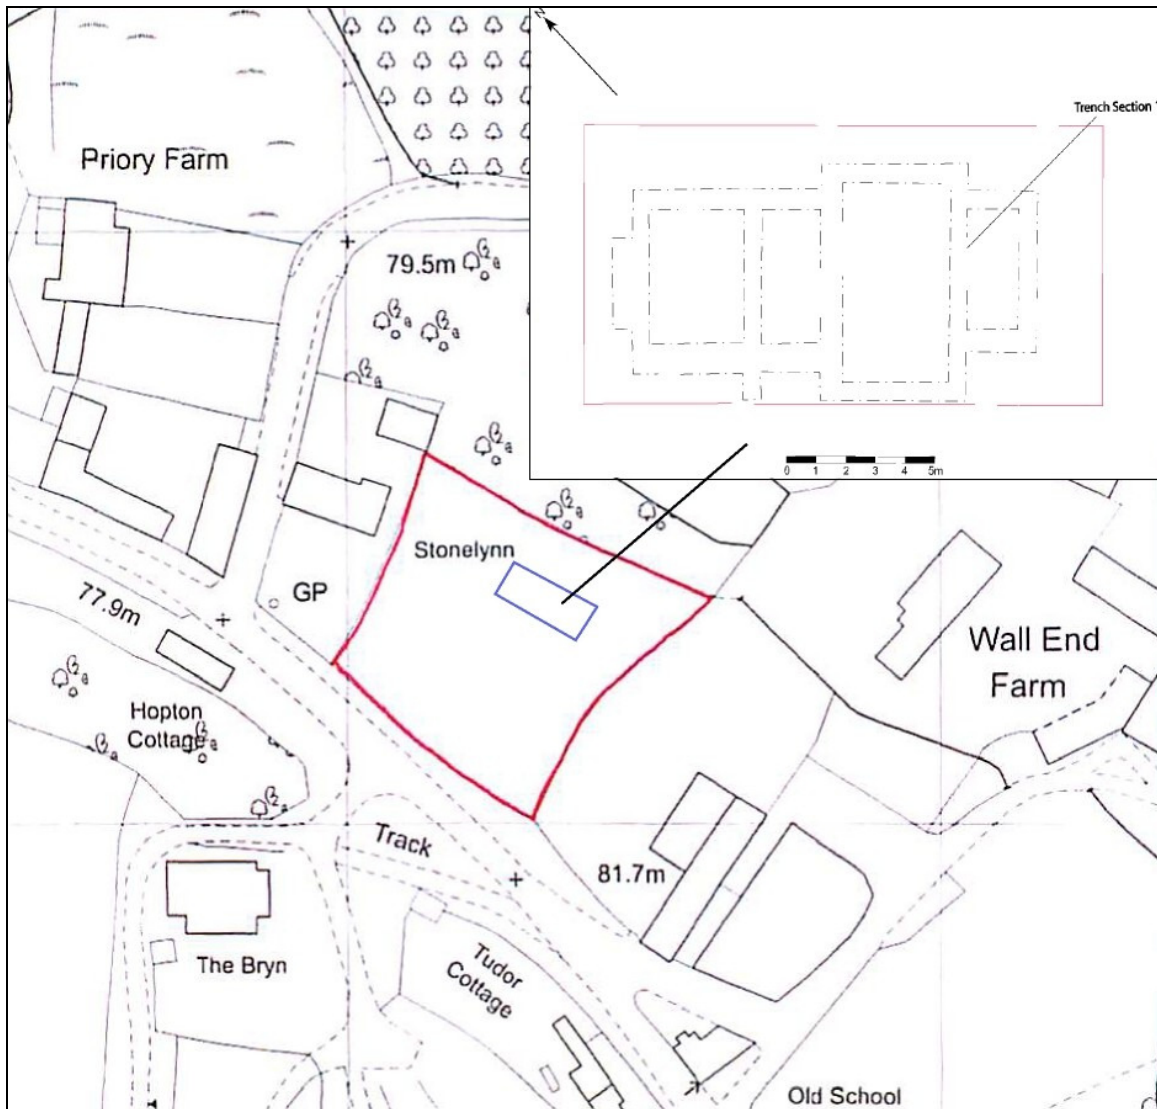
Plan (at 1:1250 scale) showing location of groundworks for proposed new dwelling (in blue) with inset plan (at scale of 1:100) showing extent of topsoil strip (in red) and foundation trenching
